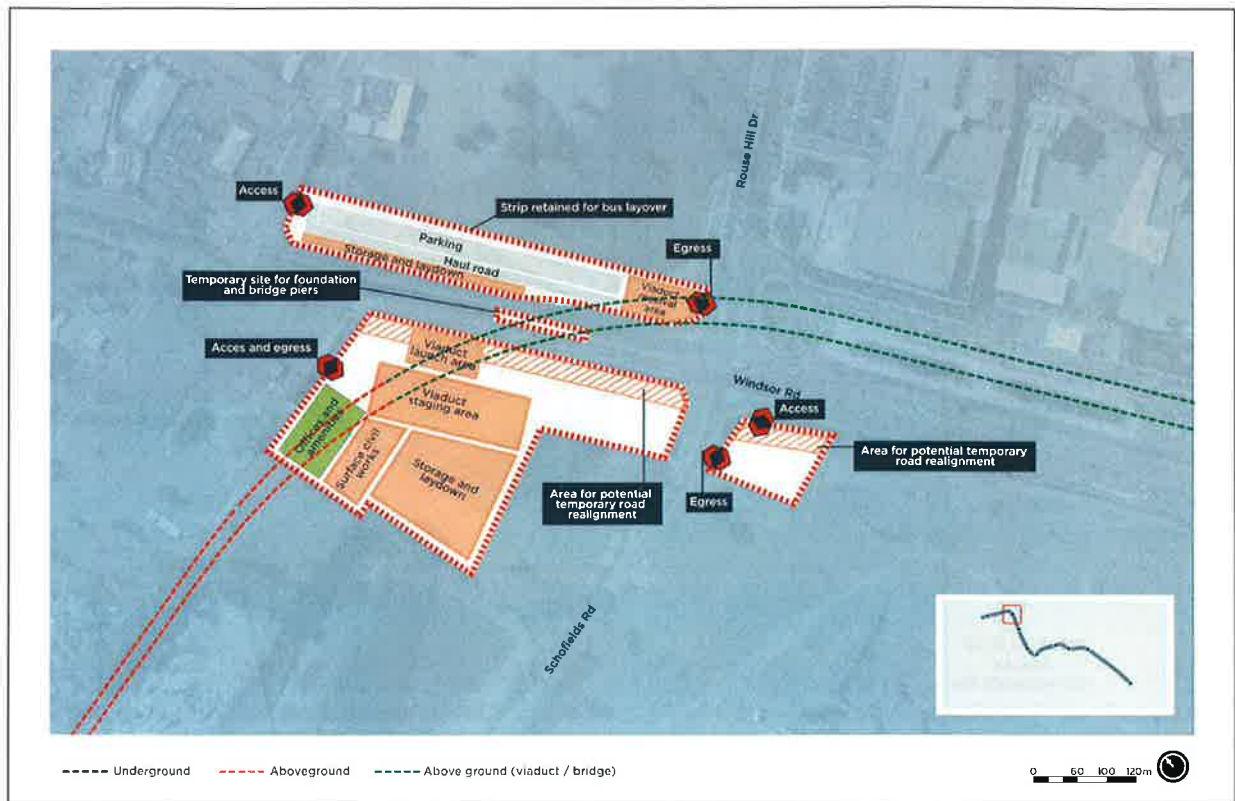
Indicative site layout of Construction Site 15 as approved in EIS 1 (approved 25 September 2012)
